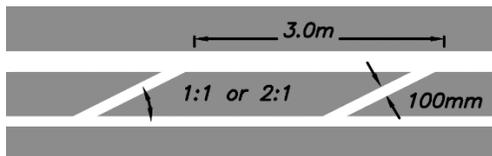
Buffered Hatching Pavement Markings (Source: Draft Alberta Bicycle Facilities Design Guide)
